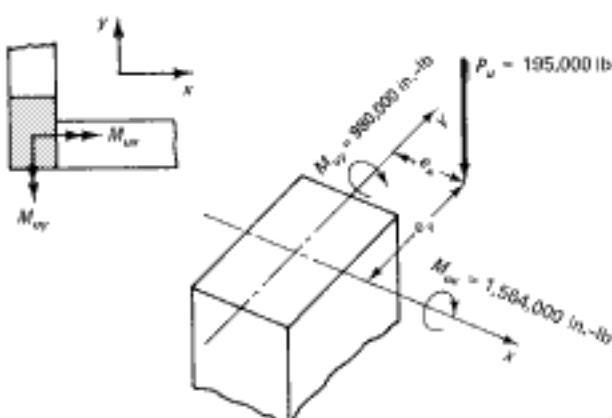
Corner column under eccentric loading on corner column in Ex. 9.16.
